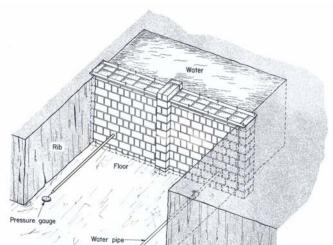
A concrete bulkhead installation with a pass-through pipe and a pressure monitoring device (Checkan, 1985)
